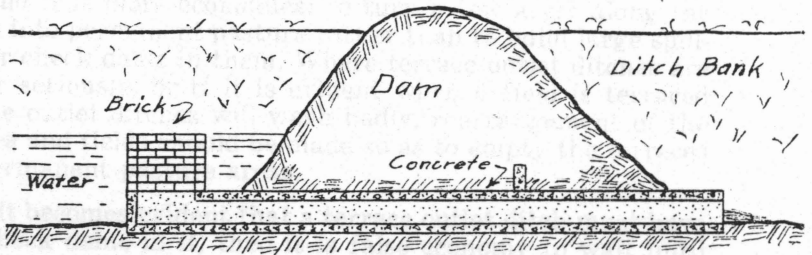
Soil saving dam with the outlet flume made in place. The outlet is raised by adding a few rounds of brick.
